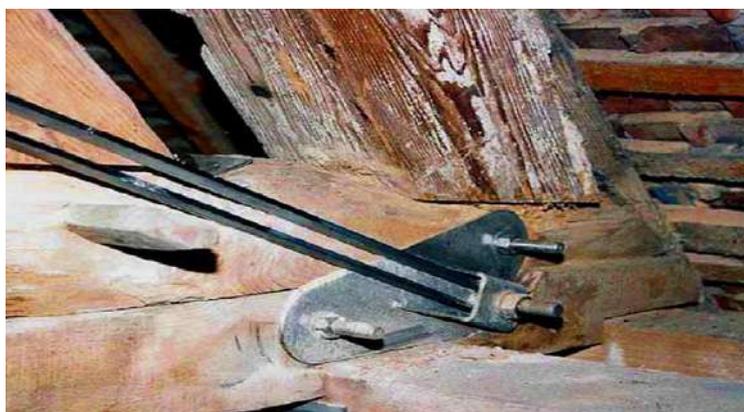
St. Marien Church. Reinforcement of the timber roof using unbounded pin-loaded CFRP straps [27].
